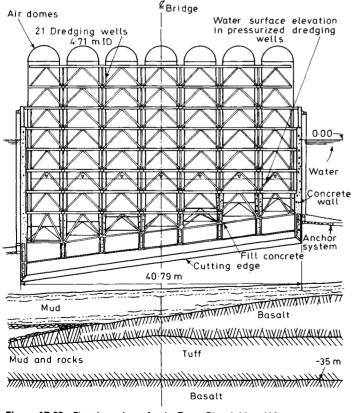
Flotation caisson for the Tagus River bridge. (After Riggs (1965) 'Tagus River Bridge – tower piers', *Civ. Engng* (USA) (Feb.) 41–45)
